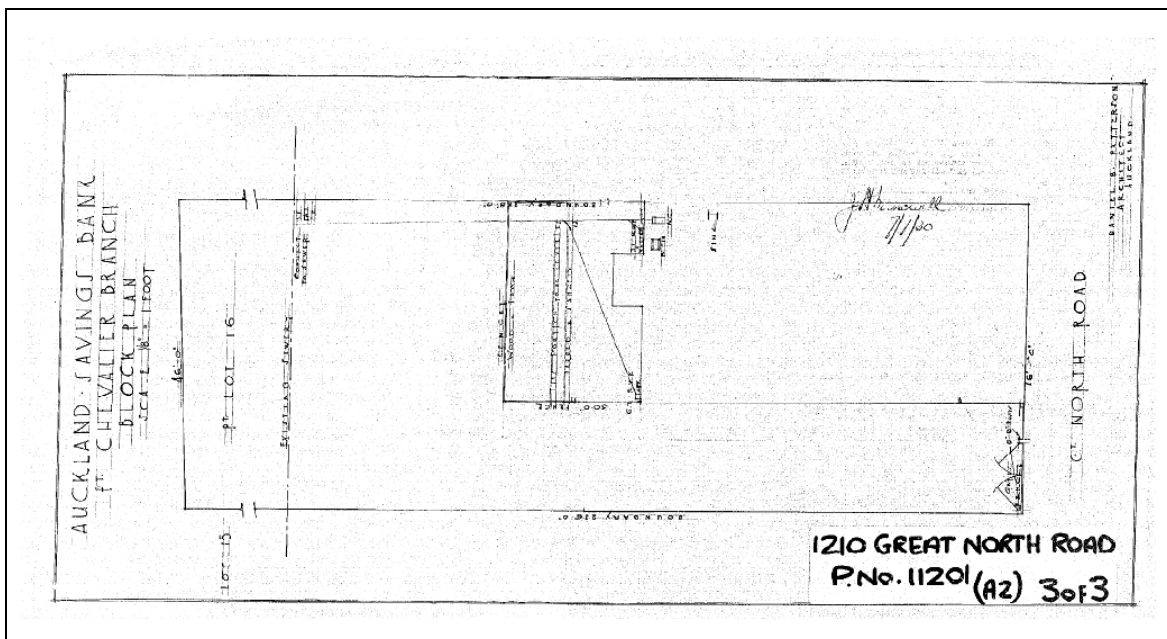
Auckland Savings Bank Point Chevalier Branch: Block plan. Auckland Council Archives. Permit No. 11201
